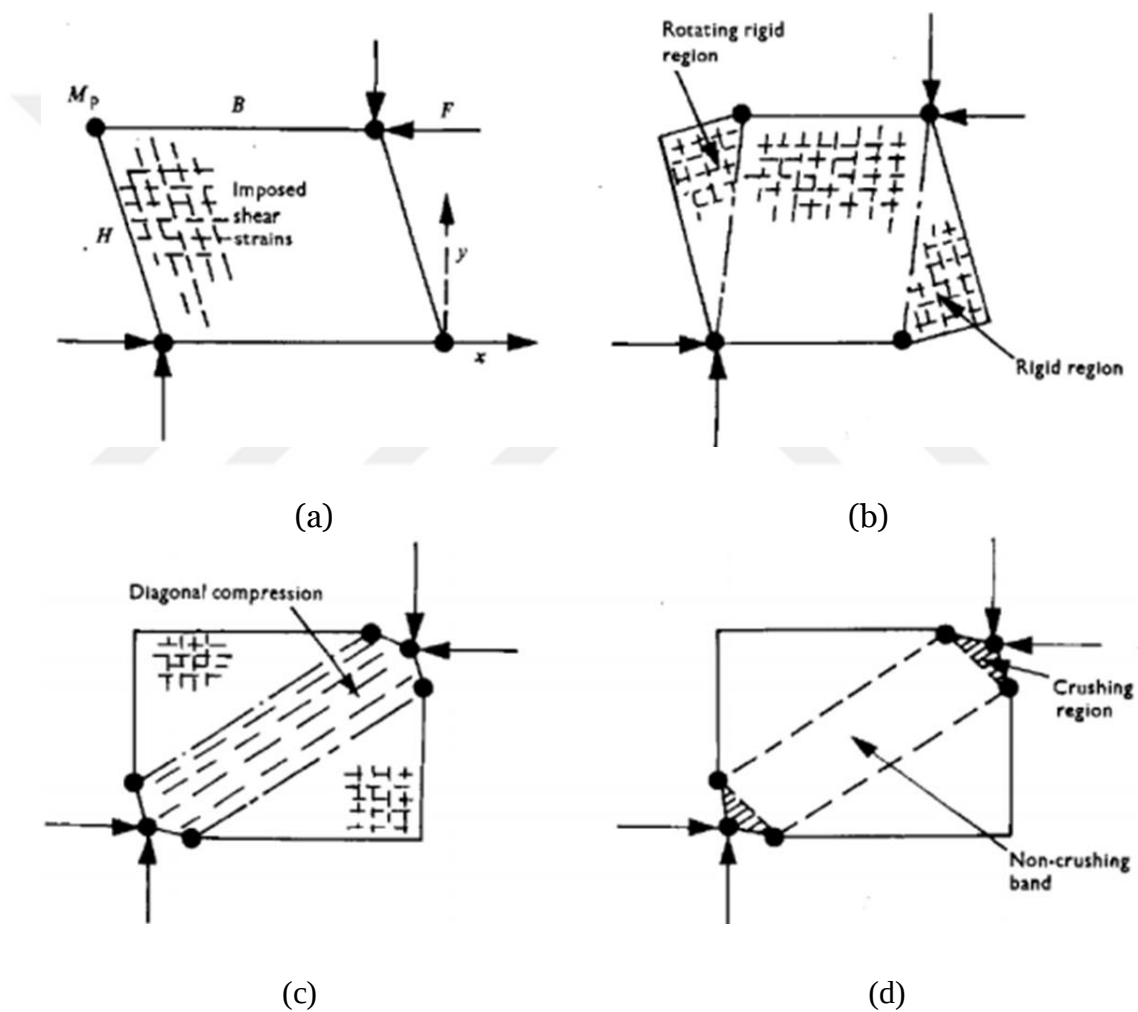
Idealized plastic failure modes for wall frame panels (Wood, 1978)
